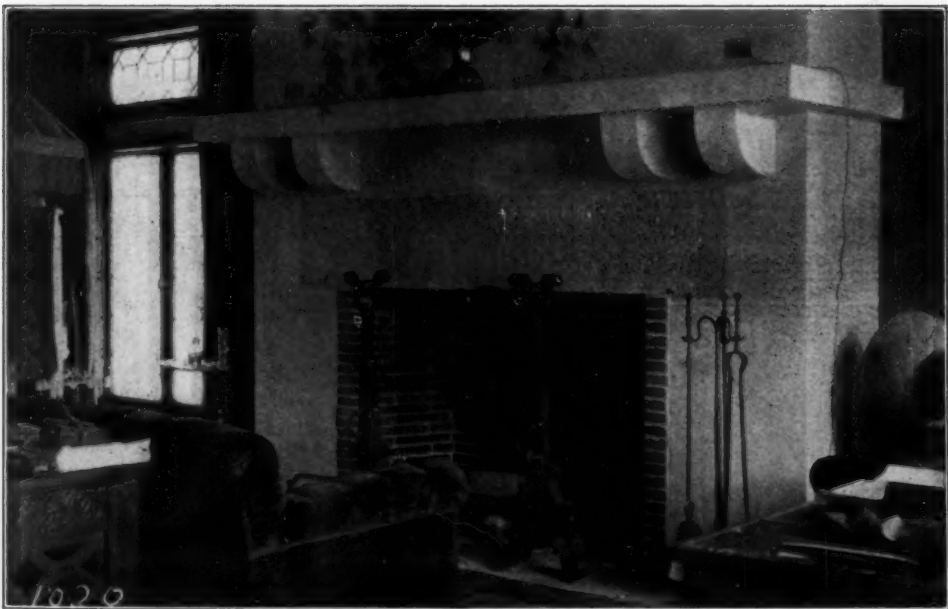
FIREPLACE IN GRIGGS HOUSE, SHOWING LINTEL OF ROUGH CONCRETE.
